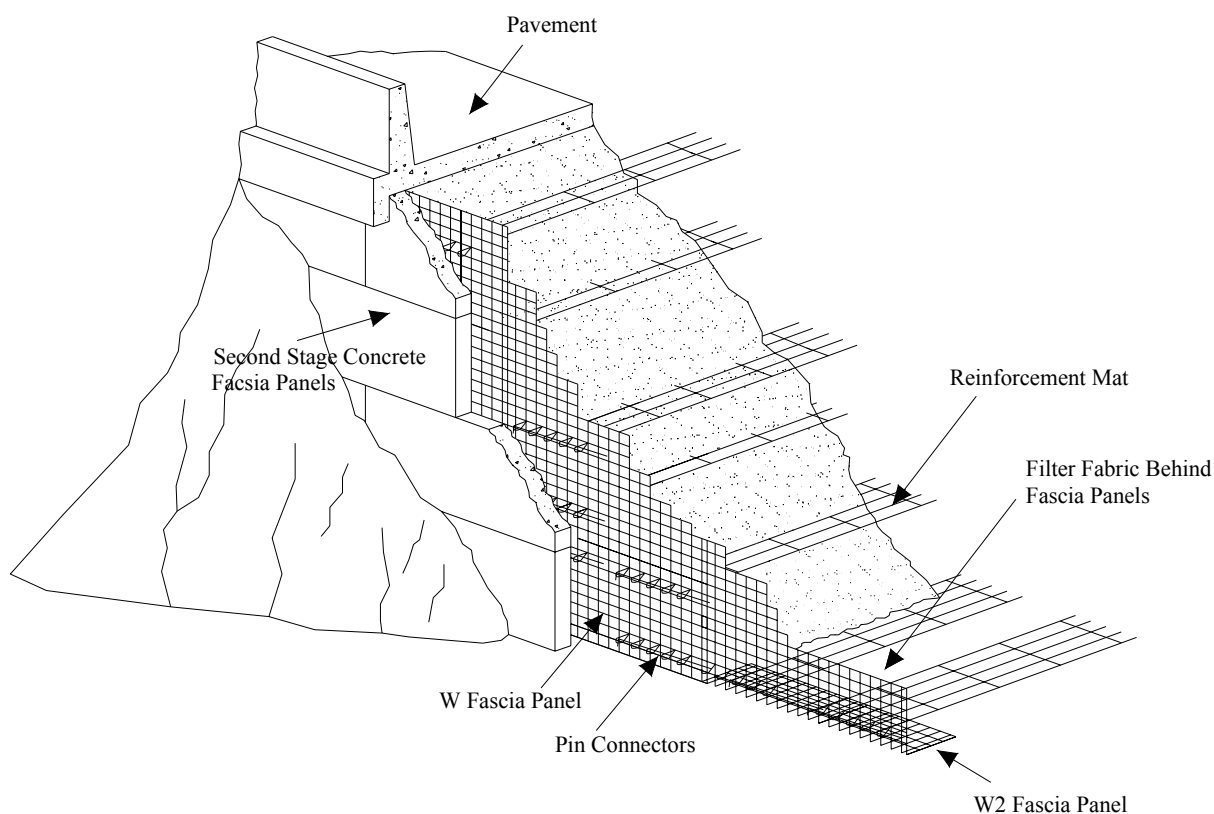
Schematic of a typical MSE wall system used on the I-15 reconstruction project.
